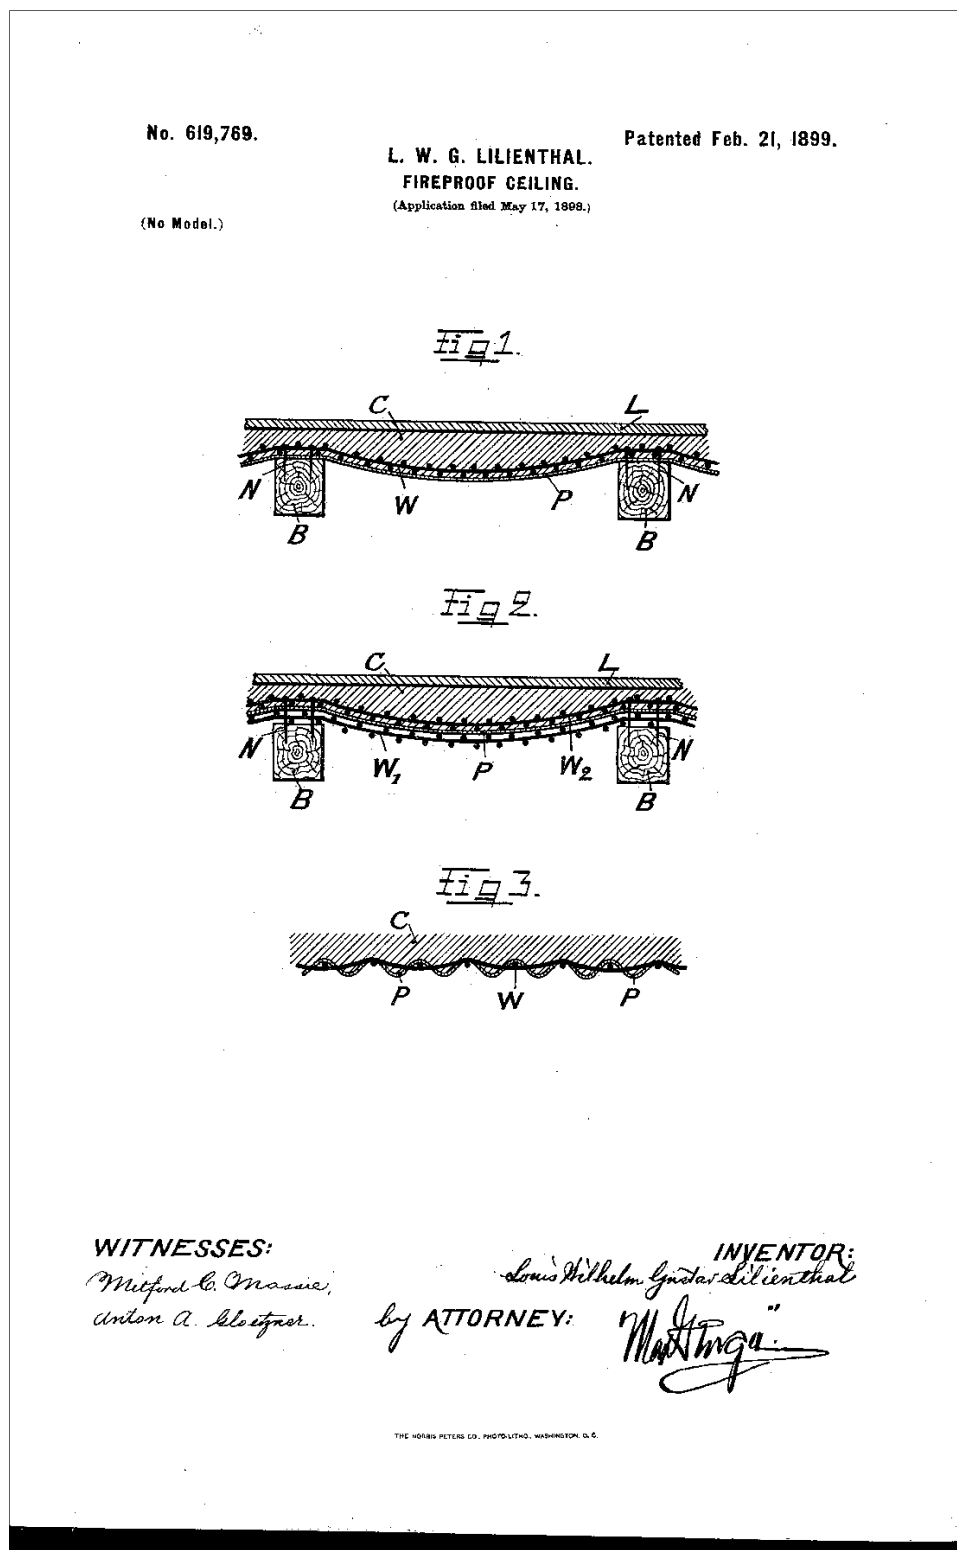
Patent drawings of the fabric formed floor from Lilienthal.
